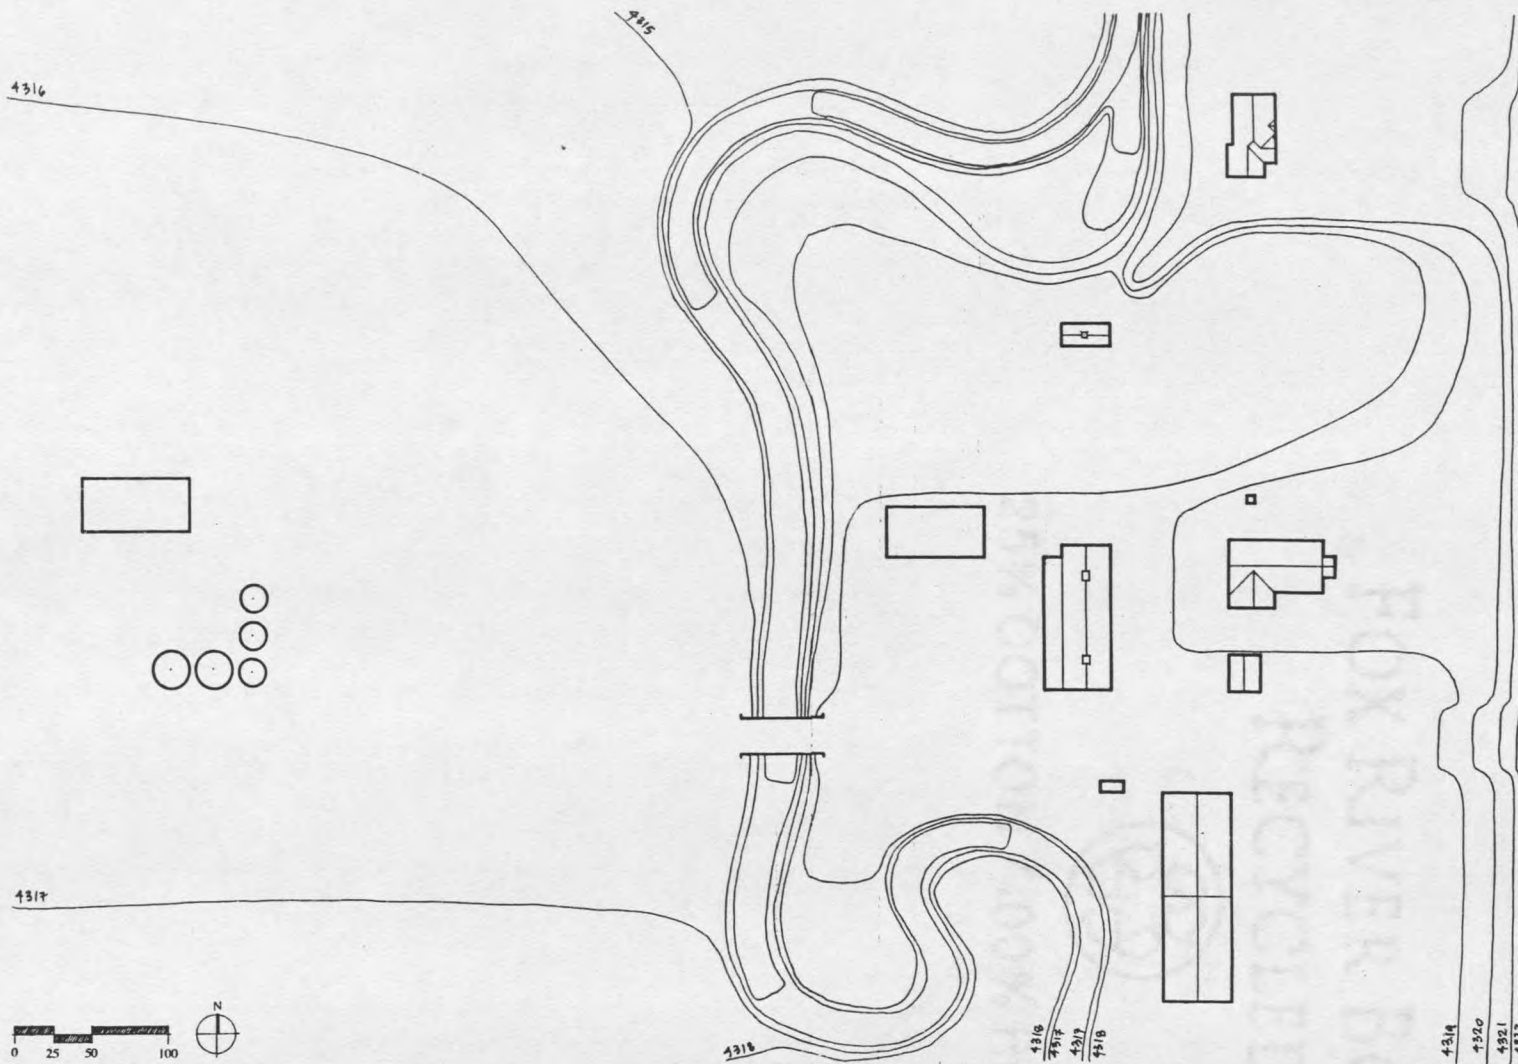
Site #2 - Topographical site plan illustrating the slightly raised, somewhat isolated platform on which the majority of the buildings stand, and the deep cut of the meandering creek adjacent to the site. (One foot interval between contour lines).
